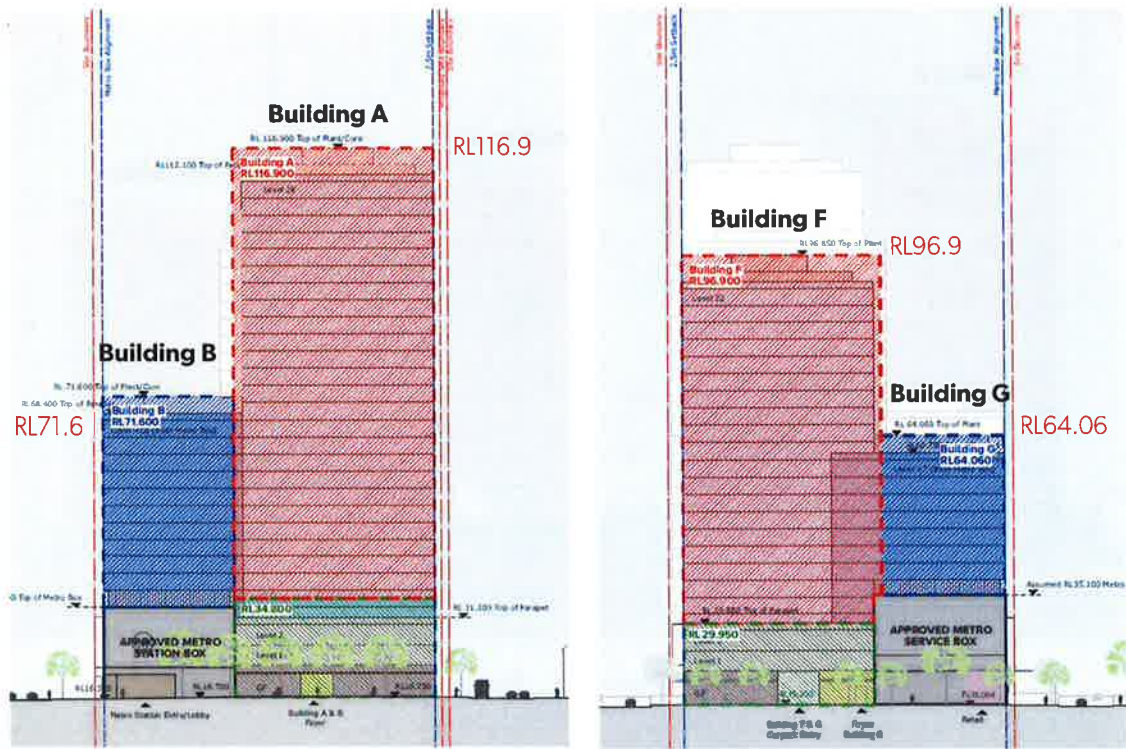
| Building Envelope Elevation Plan – Cope Street (Source: Applicant's RtS)
